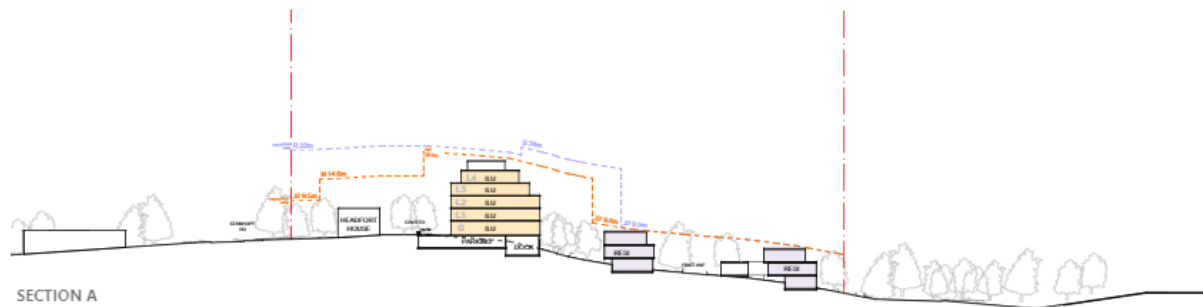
Section plan showing Headfort House and illustrative masterplan development
